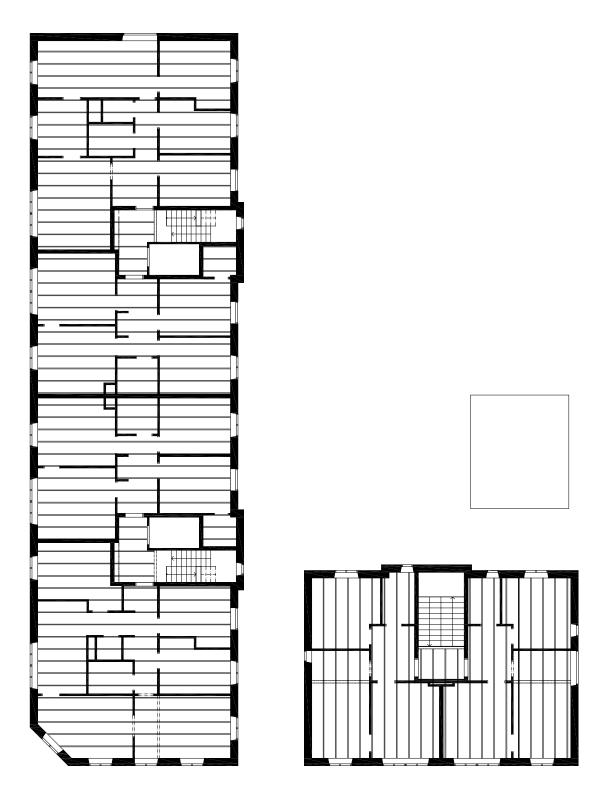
Plan for beams, scale 1:200. Beams showed on second story.
